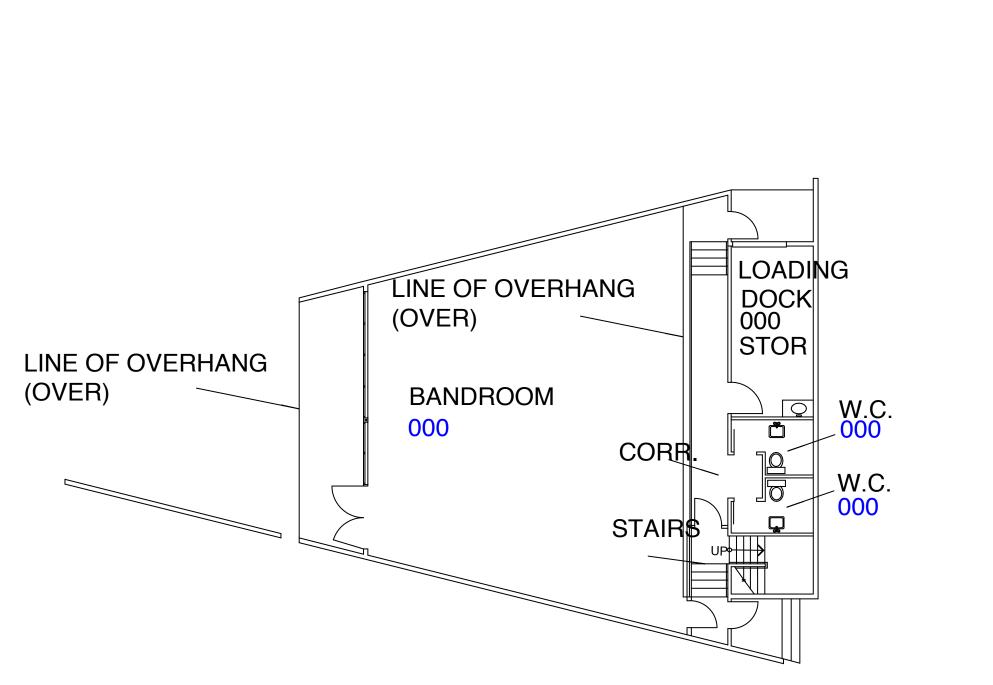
Existing - SITE PLAN SD68 NDSS SITE
